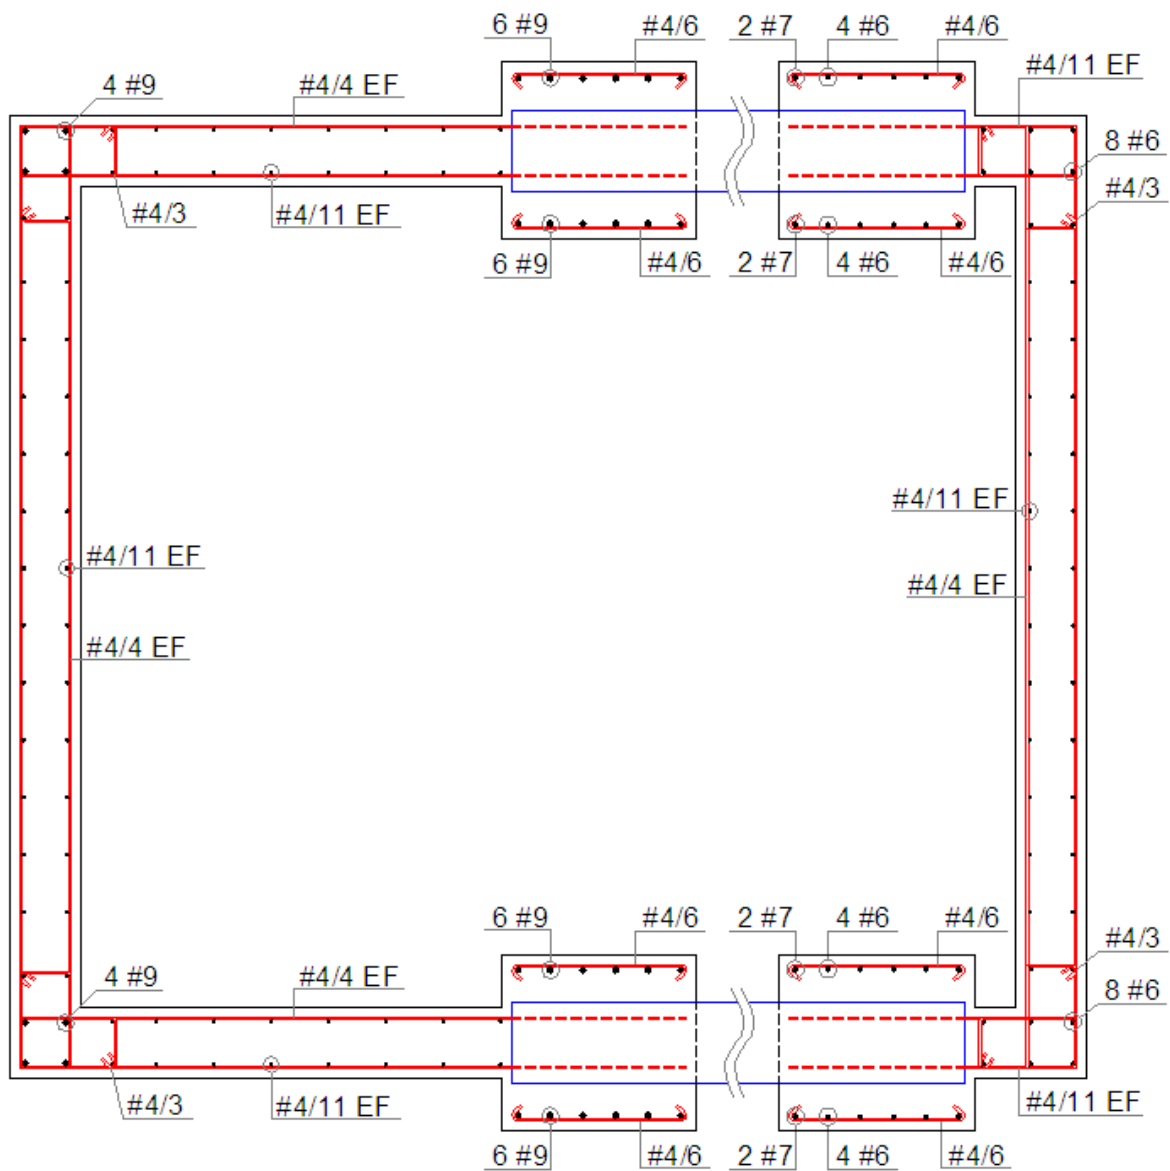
Section 2 reinforcement detail of CCW (stories 3-4)
